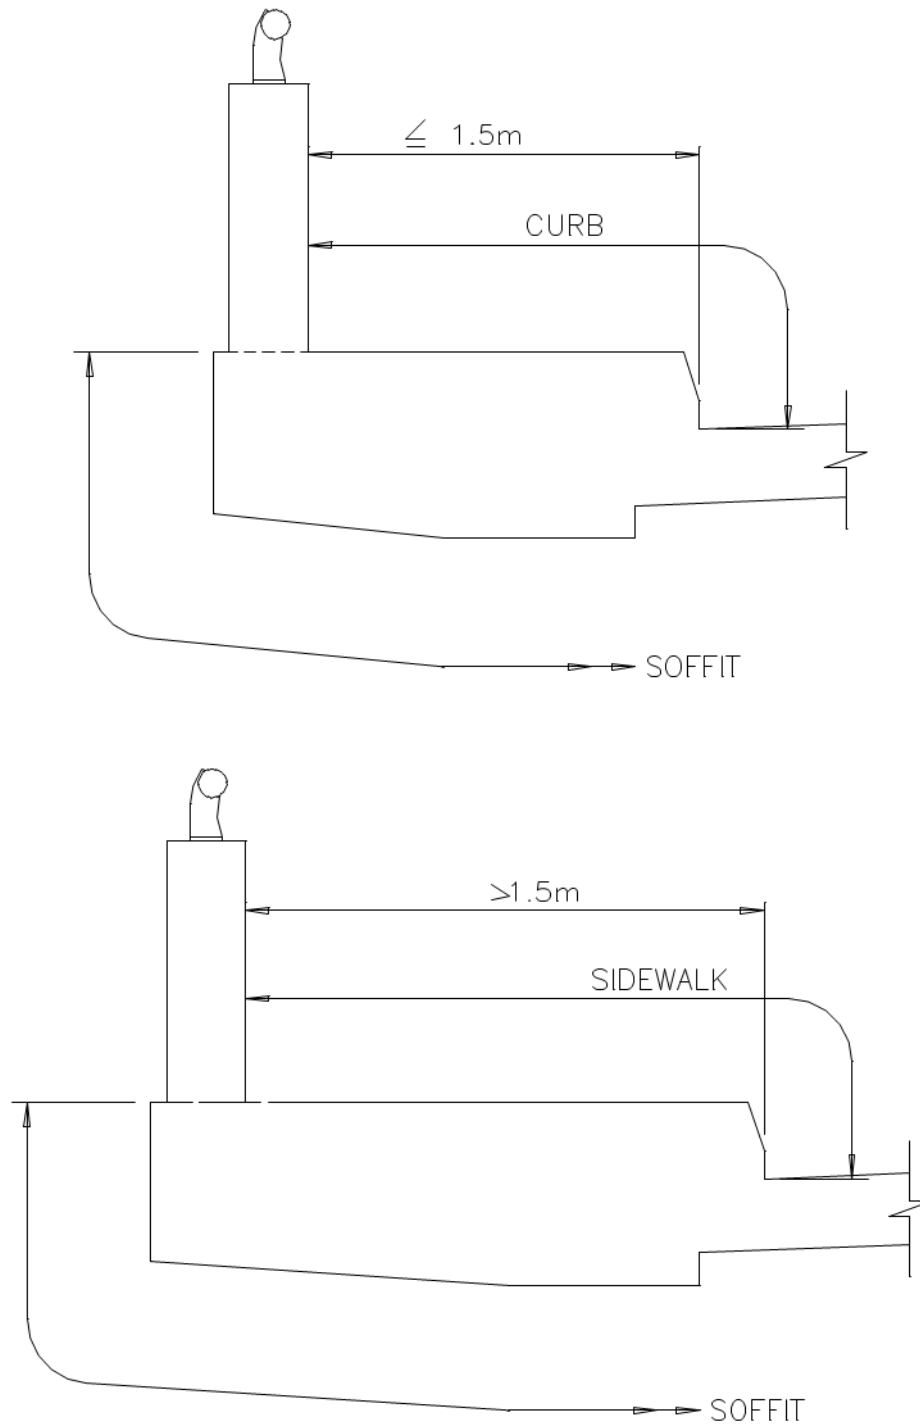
Curb and Sidewalk Definitions.
